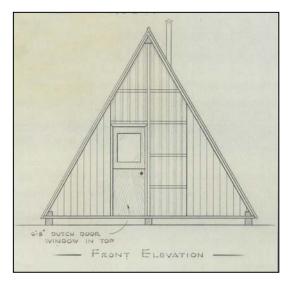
Front Façade detail from Outlying Cabin Plate 29L 1963
